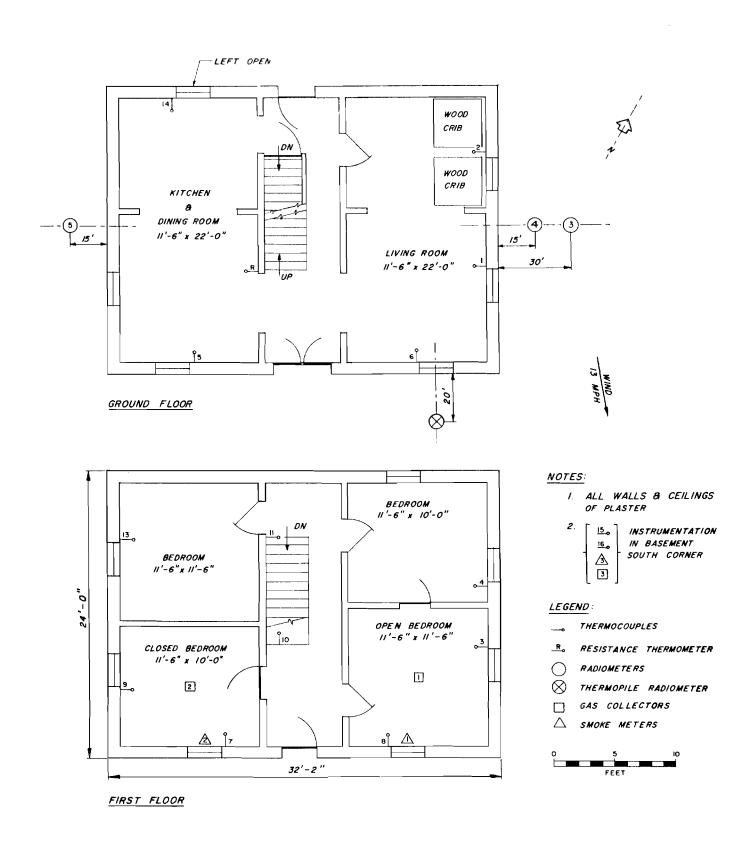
BUILDING No. 7 - TWO - STOREY SOLID BRICK DWELLING
